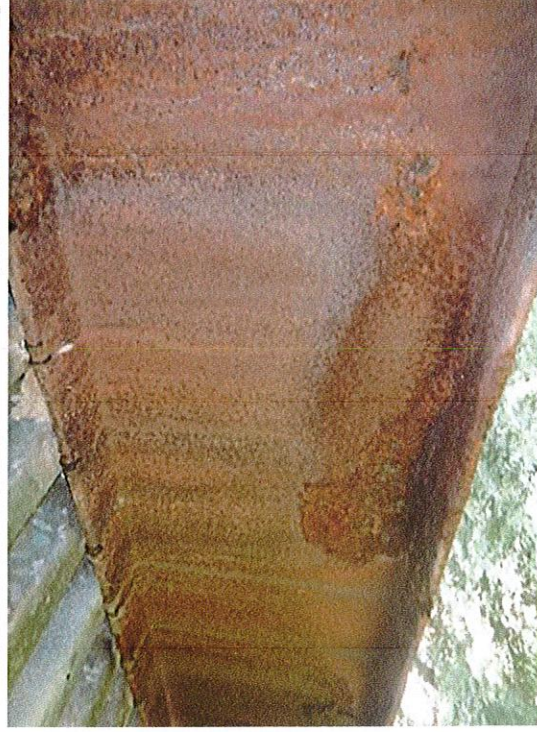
SPAN 2, WEST GIRDER: Intermittent locations of 6" tall x 1/8" deep section loss to web
